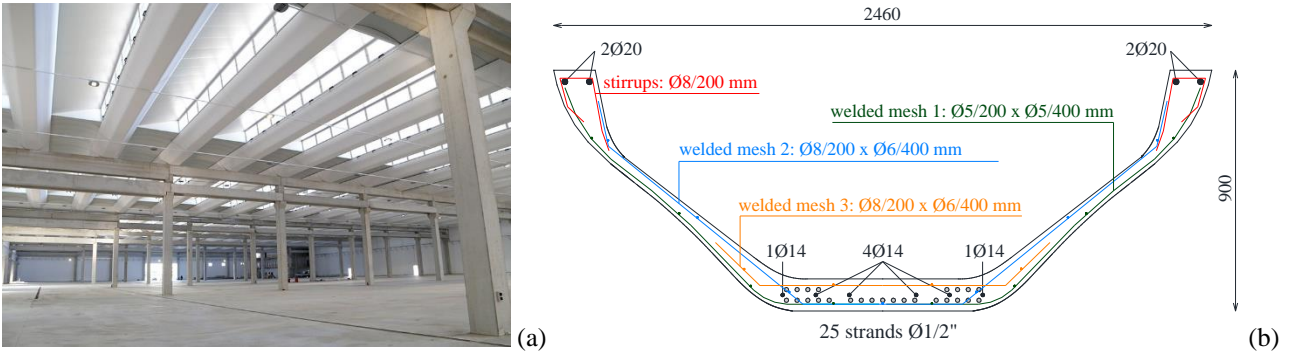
Investigated three-plate roof element: (a) application in an industrial building; (b) sketch of the current cross section (dimensions in mm) with reinforcement arrangement of the tested specimen.
